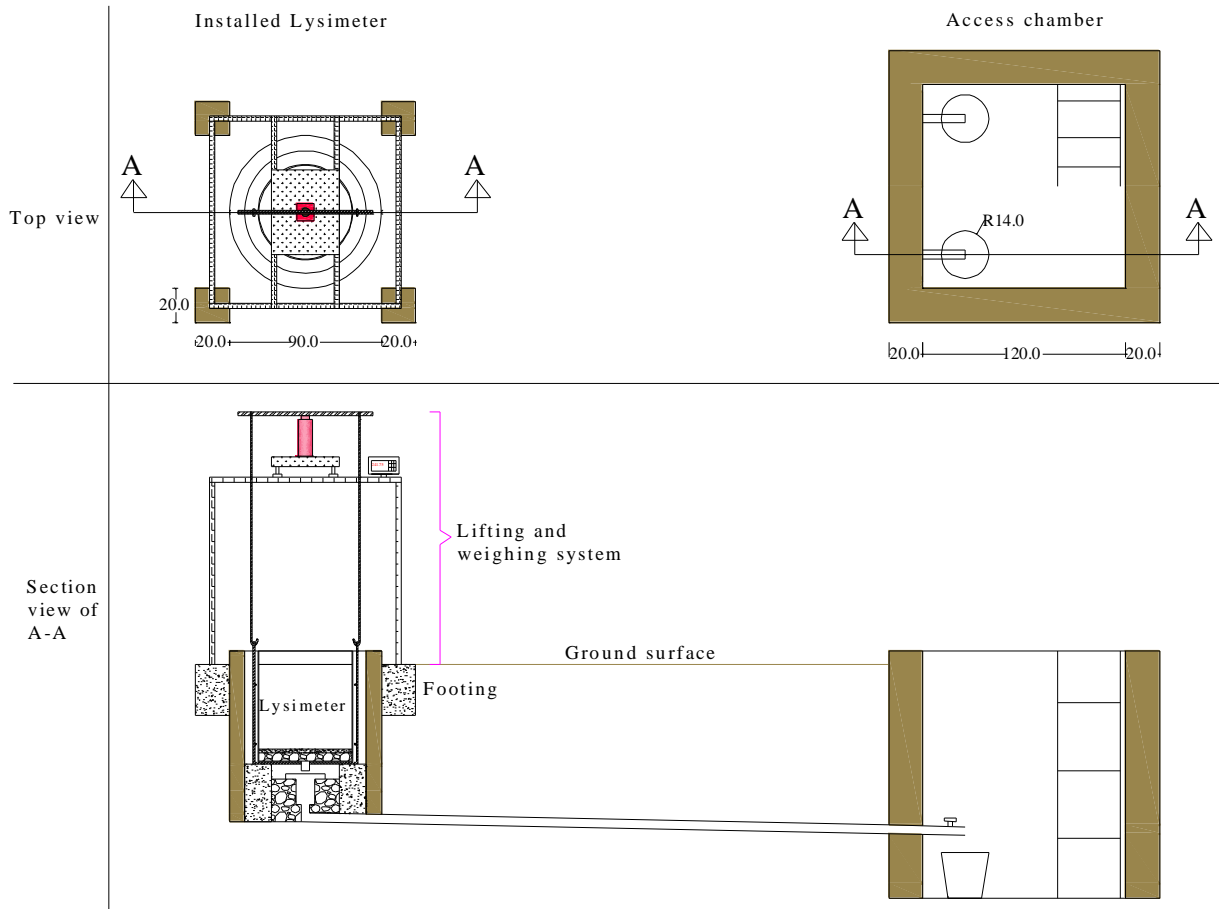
A design drawing of the installed lysimeter at Melkasa Agricultural Research Center; showing the system components: the lysimeter, drainage system, lifting, and weighing system
